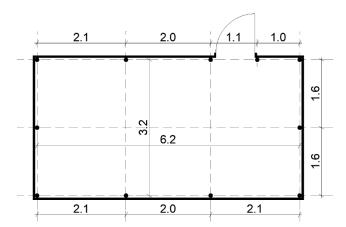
Daddab shelter floor plan (UNHCR, 2021)
